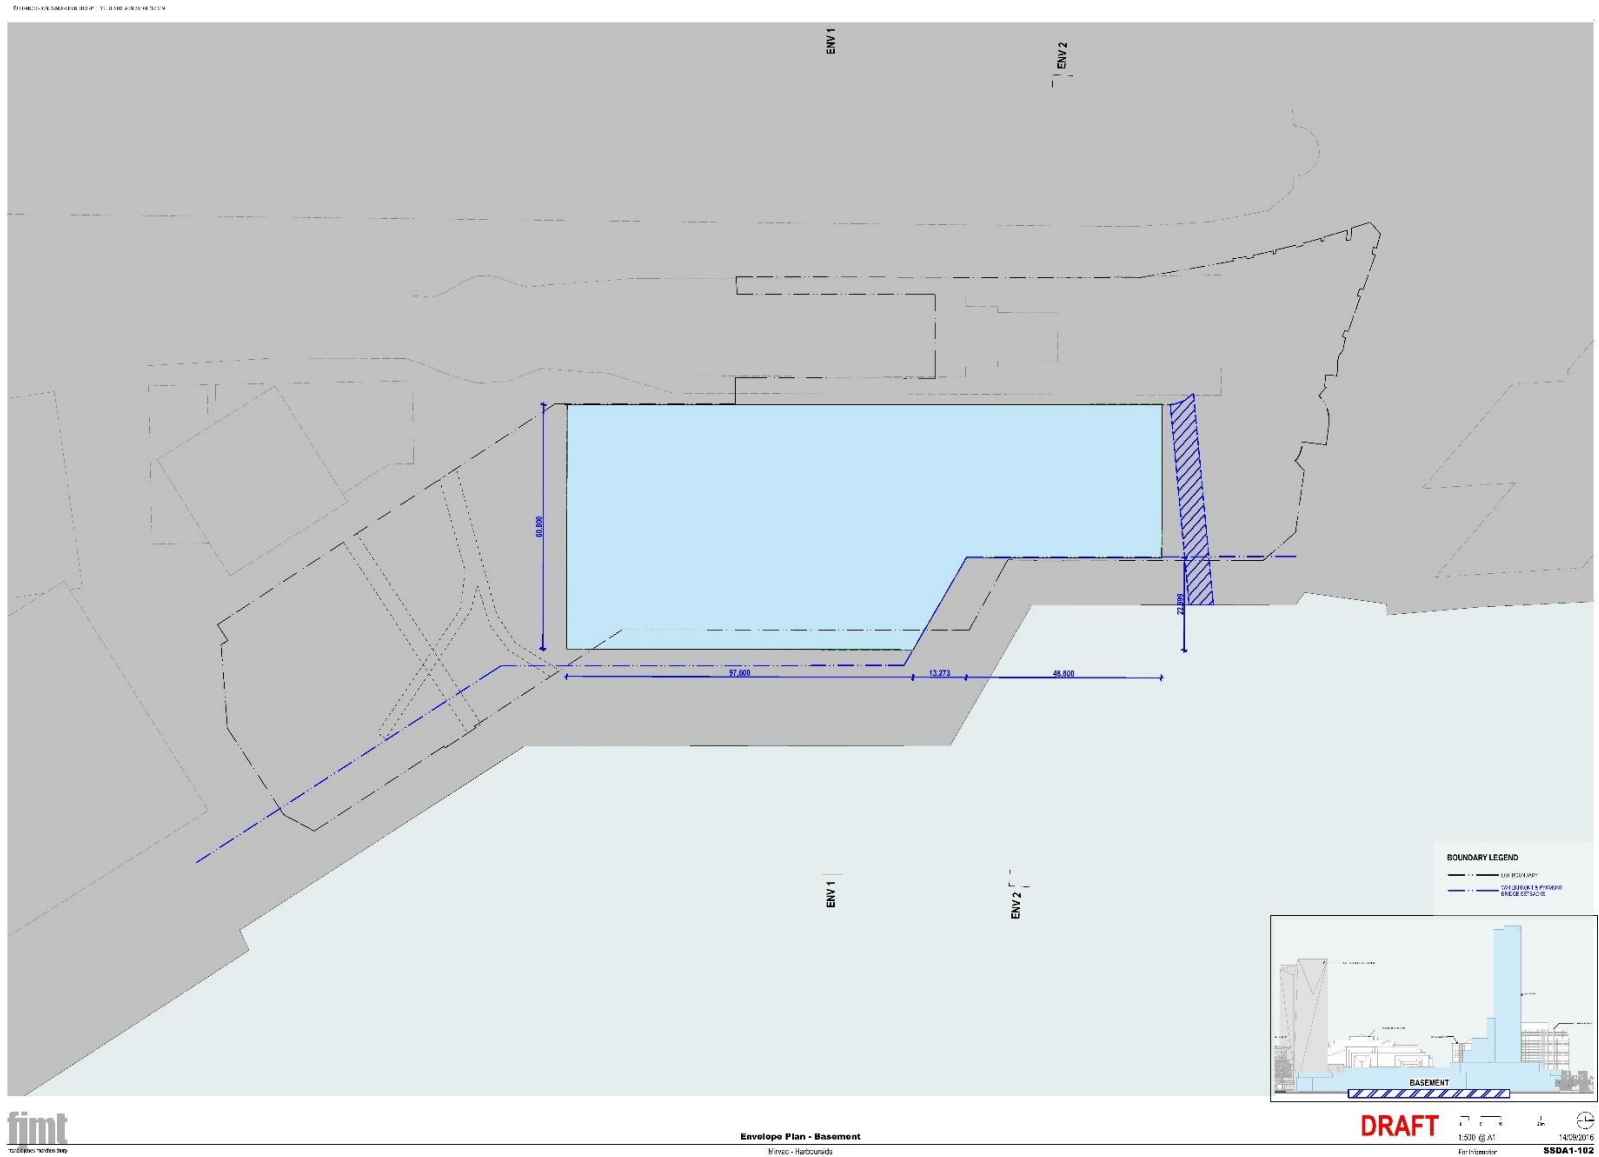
PROPOSED BASEMENT AREA (DRAFT PLAN). SOURCE: FJMT PLAN NO. SSDA1-102 ISSUED 14/9/16)
